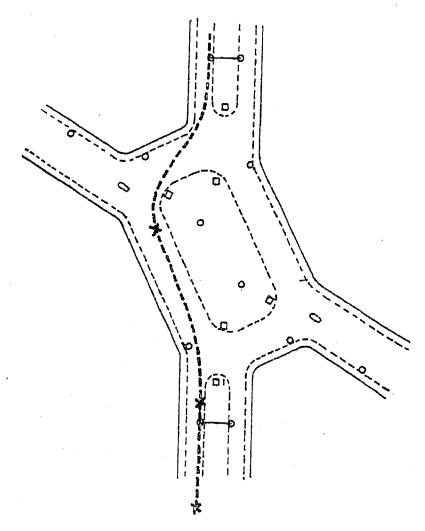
Plan of lighting scheme for intersection with roundabout.
